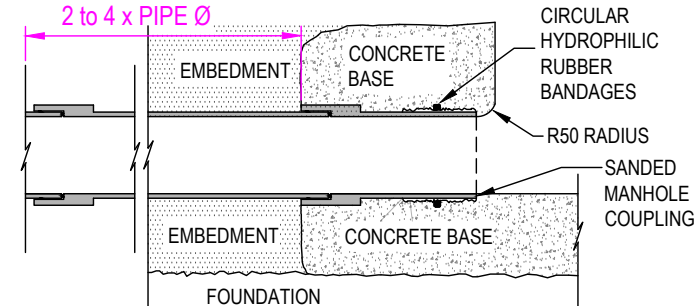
G: GRP PIPE CONNECTION (SECTION VIEW)
